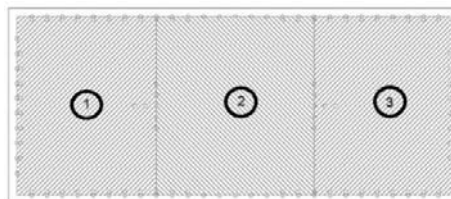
Core concrete division in the pier section of Shahid Bakri Bridge
